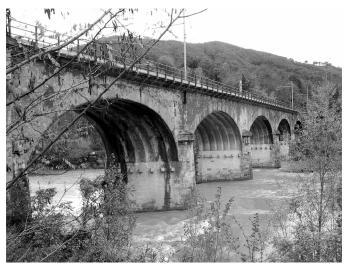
View of the bridge in Lama di Reno on the Porrettana railway
